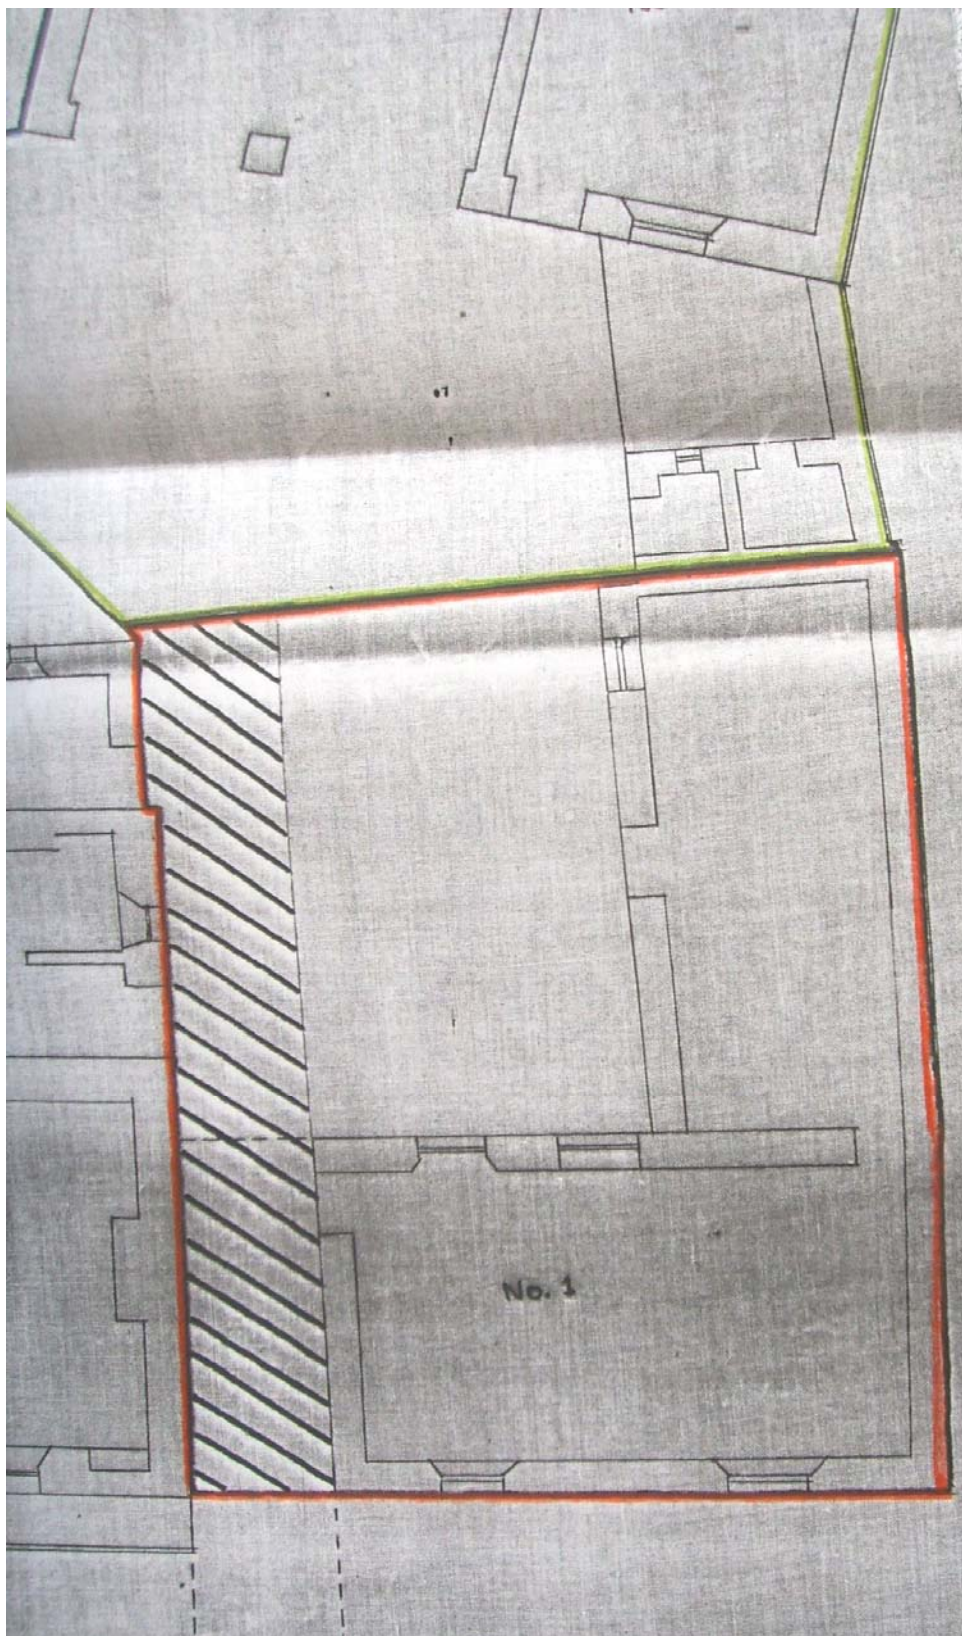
Plan of 1973 include with the deeds showing part of the ground floor interior of the north section of The Castle Hotel (Building 1)
